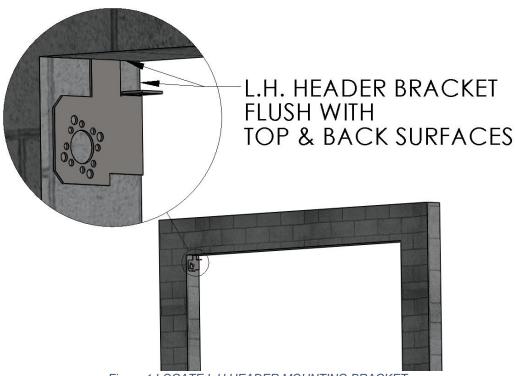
LOCATE L.H.HEADER MOUNTING BRACKET
